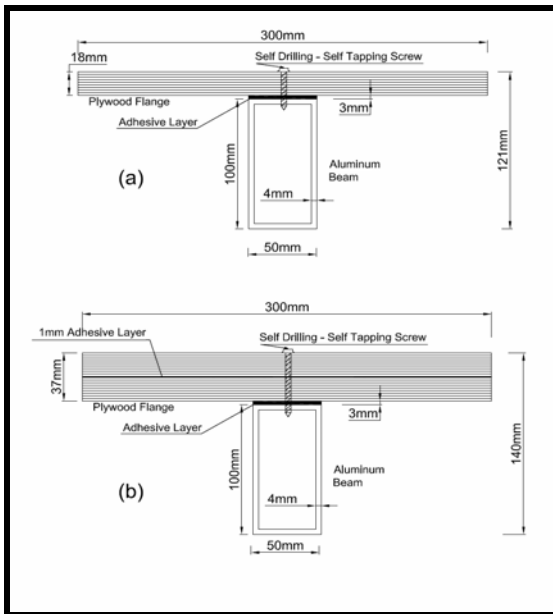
Typical Cross Section of Timber - Aluminum Composite Beams (a) one layer plywood flange , (b) two layers plywood flange
